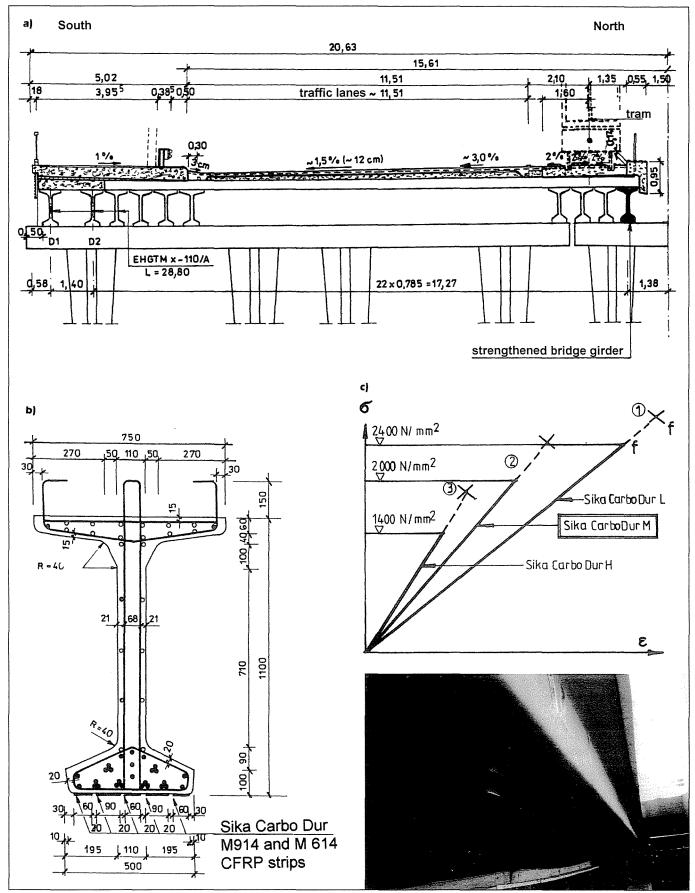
Strengthening of a prefabricated prestressed pre-tensioned concrete bridge girder in Budapest, Petőfi bridge owing to the failure of some prestressing strands due to corrosion. (Date: Sept. 1997, Strengthening strips: Sika CarboDur H914-56 m and M614-84 m. Designer: Budapest University of Technology: Dr. György L. Balázs and Dr. György Farkas. Exec: Pannon Freyssinet Ltd.) a) Cross-section of the bridge
